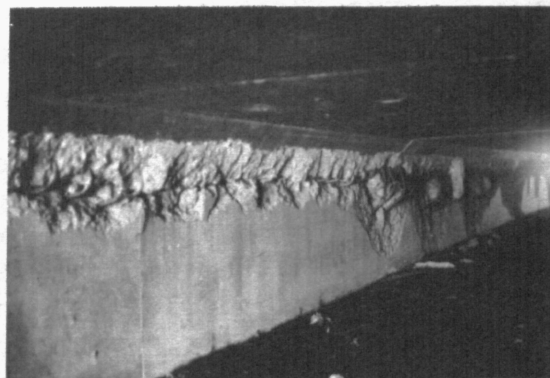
Photograph Number 9. East wall of double box Effluent Conduit after backfill removed. This was the point of heaviest damage.
